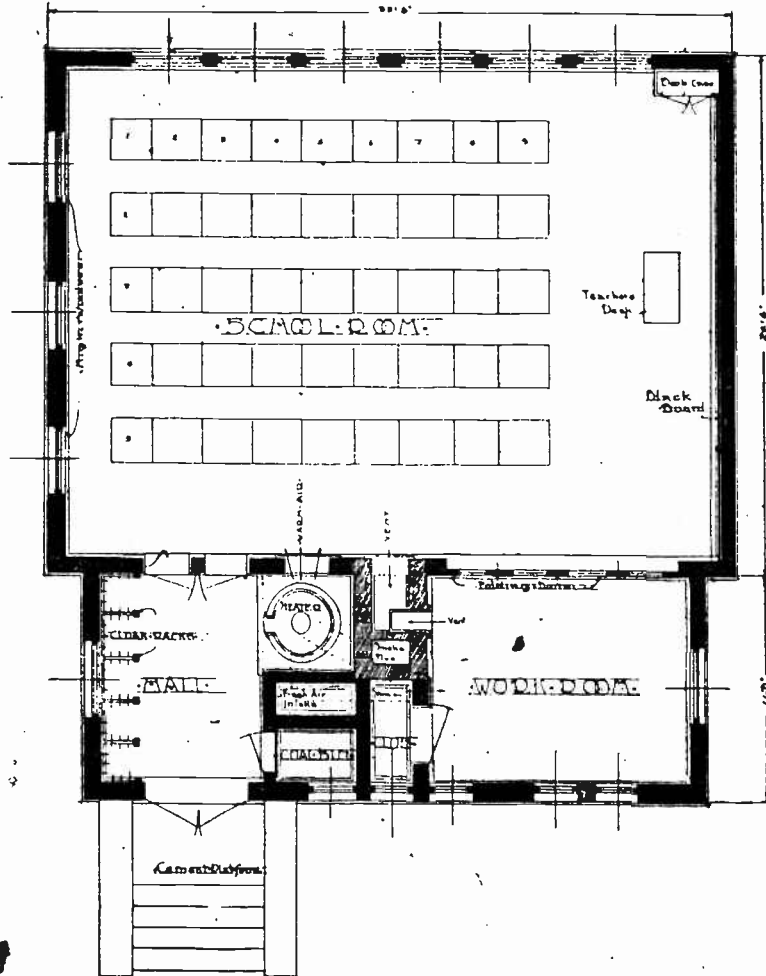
Floor plan of model one-room school, showing seat room. J. H. Felt & Co., Kansas City, Mo., architects.
